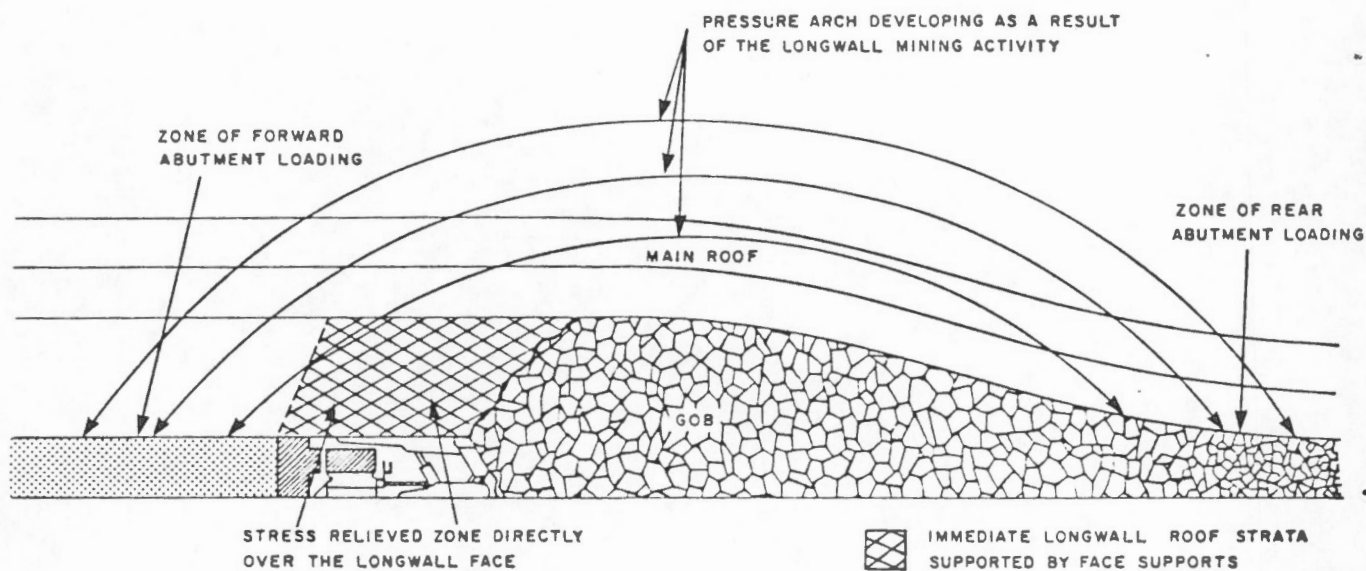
CROSS SECTION THROUGH AN ACTIVE LONGWALL PANEL
